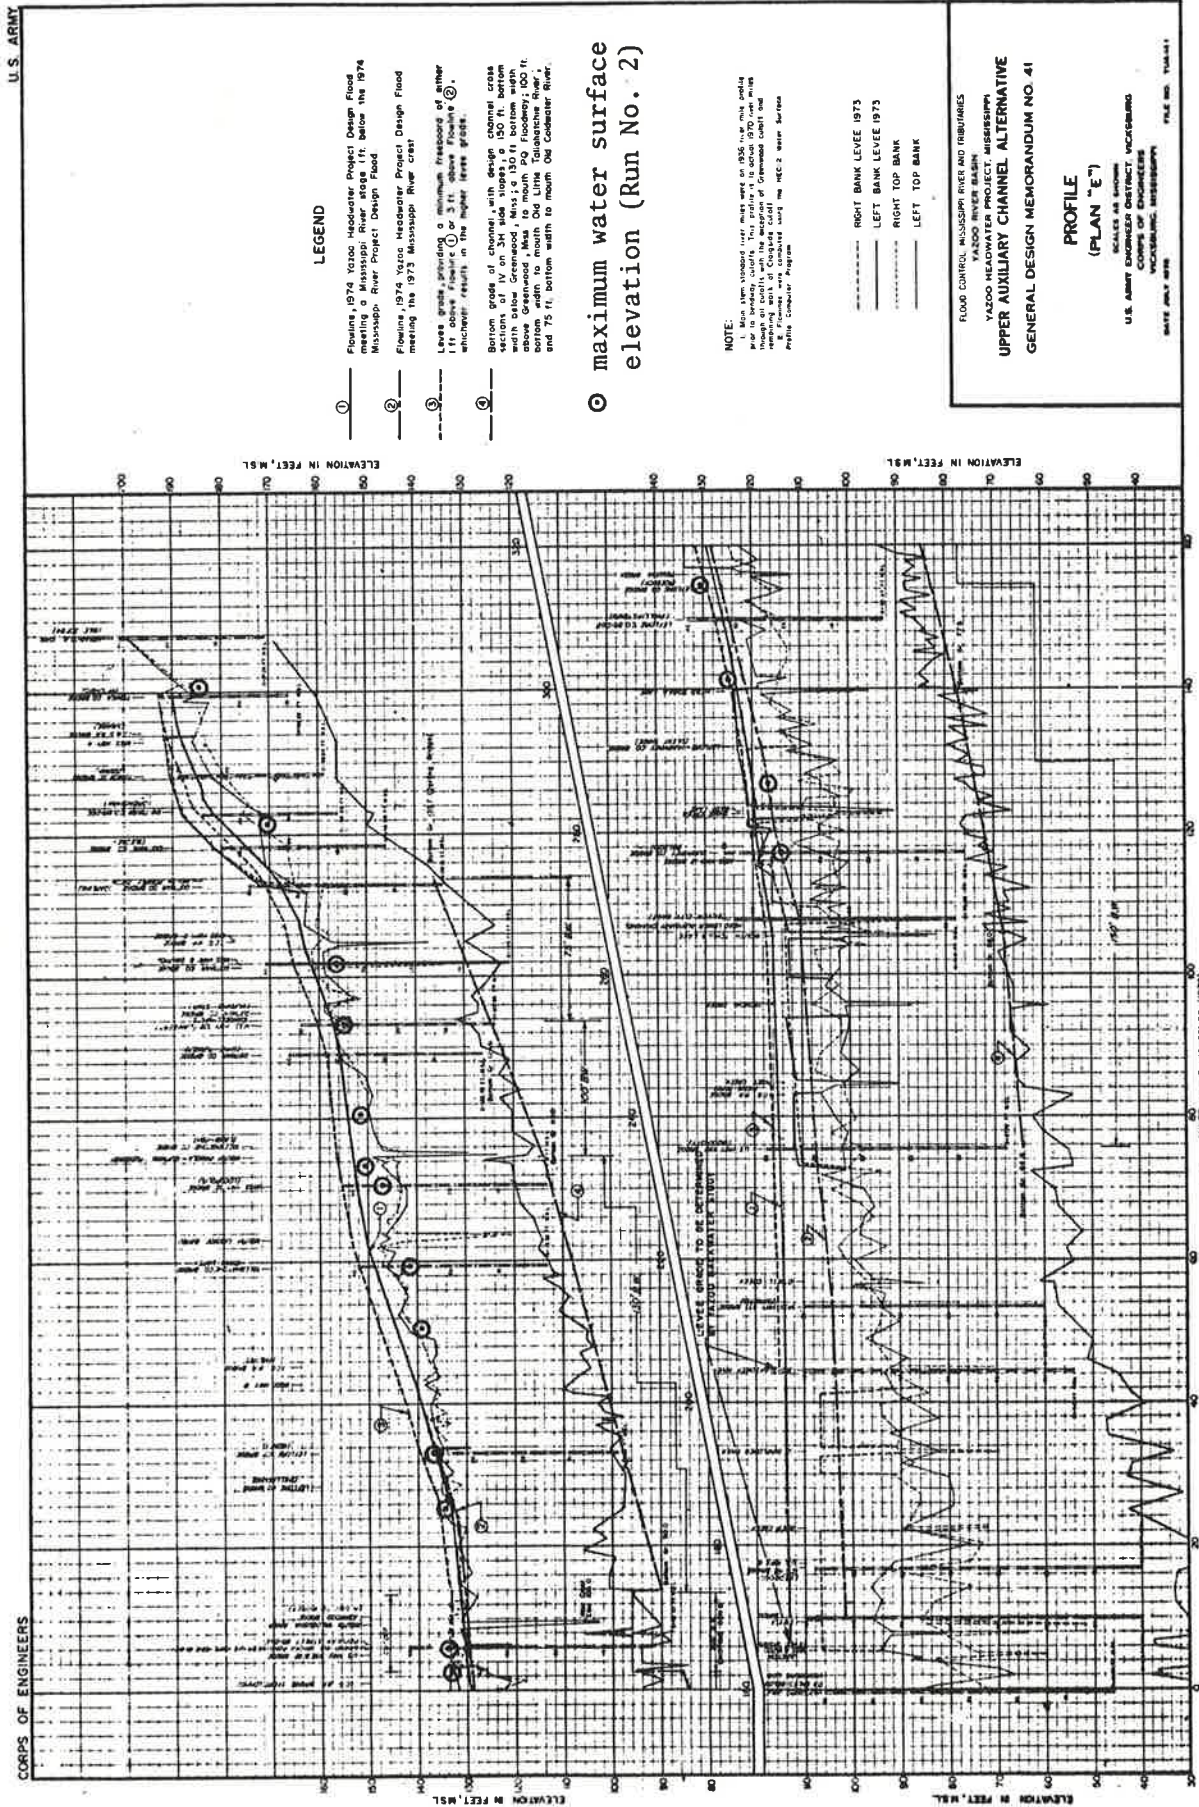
Maximum water surface elevations for Plan E (Run No. 2) and flowlines of project design flood.
